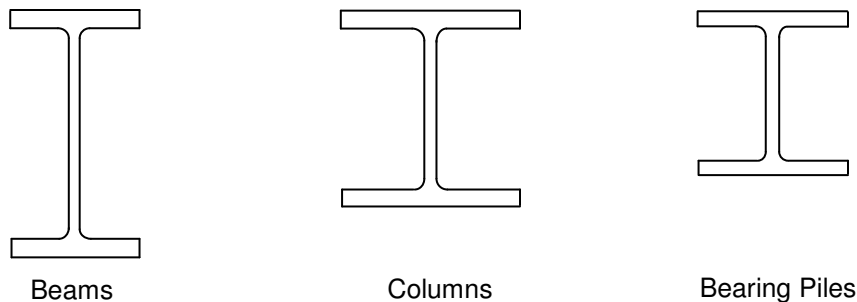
Parallel Flange Beams, Columns and Bearing Piles
